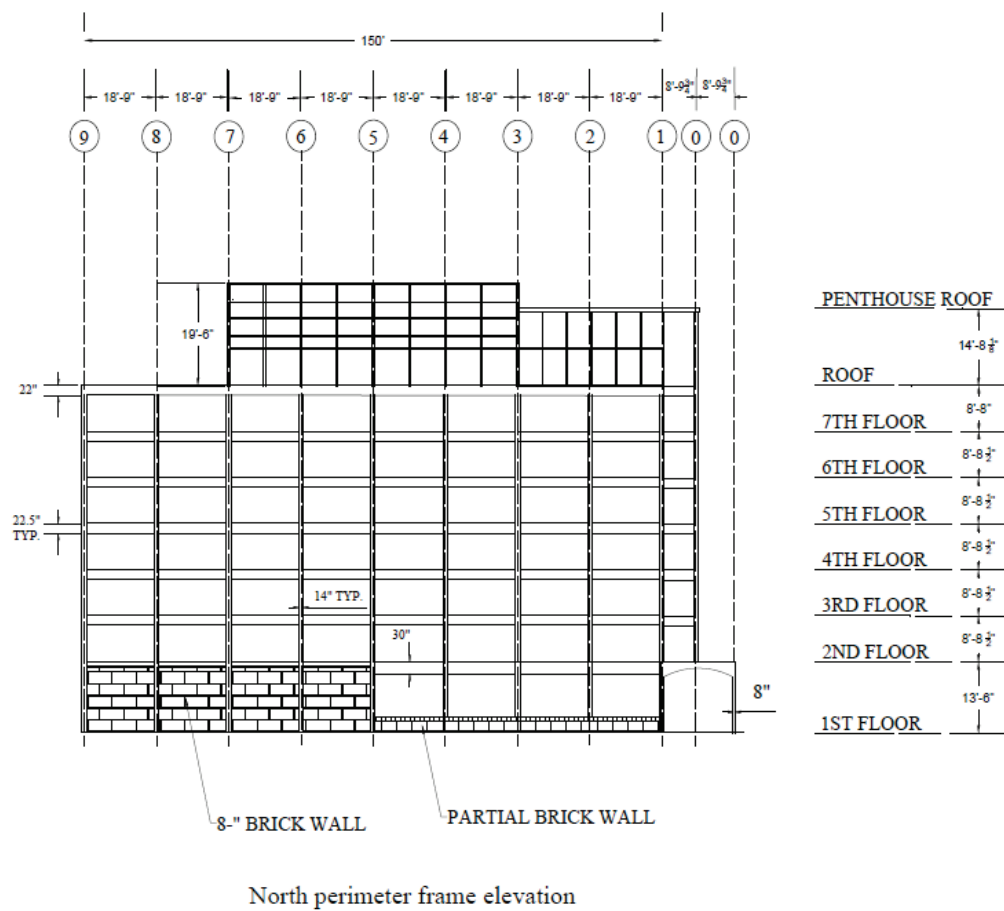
Elevation of study building (source: original drawings by Rissman and Rissman Associates).
